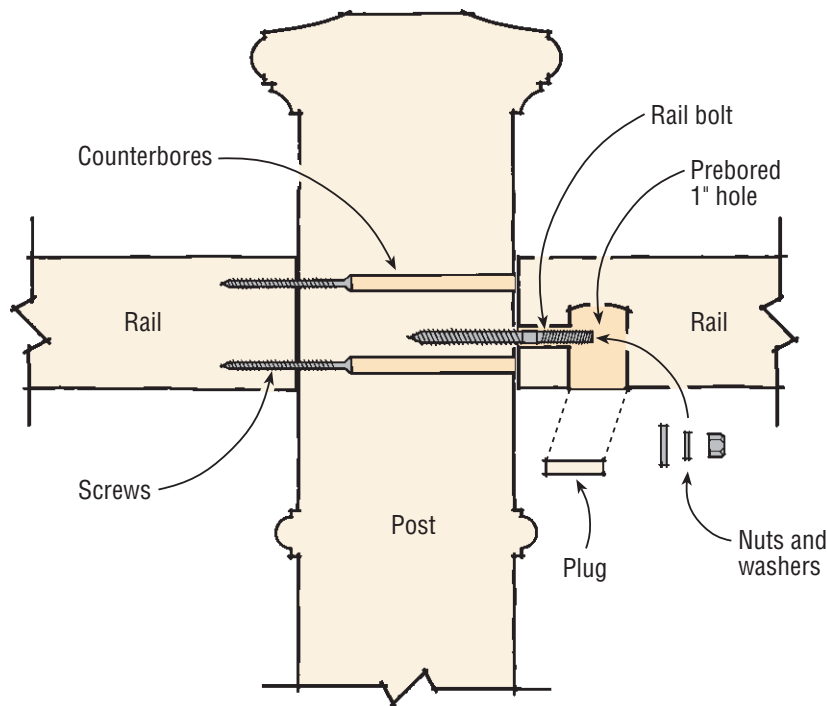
Where two rails meet at a post, only one side can be screwed. The other side is attached with a rail bolt. One end of the bolt has screw threads for attaching to the post; the other end is machine-threaded to accept a nut. A pilot hole for the bolt in the end of the rail and a 1 inch hole for the nut under the rail are prebored at the shop. In the field, the installer has to drill a pilot hole in the post, attach the bolt, and then tighten the nut on from beneath the railing. A plug hides the hole in the rail.
